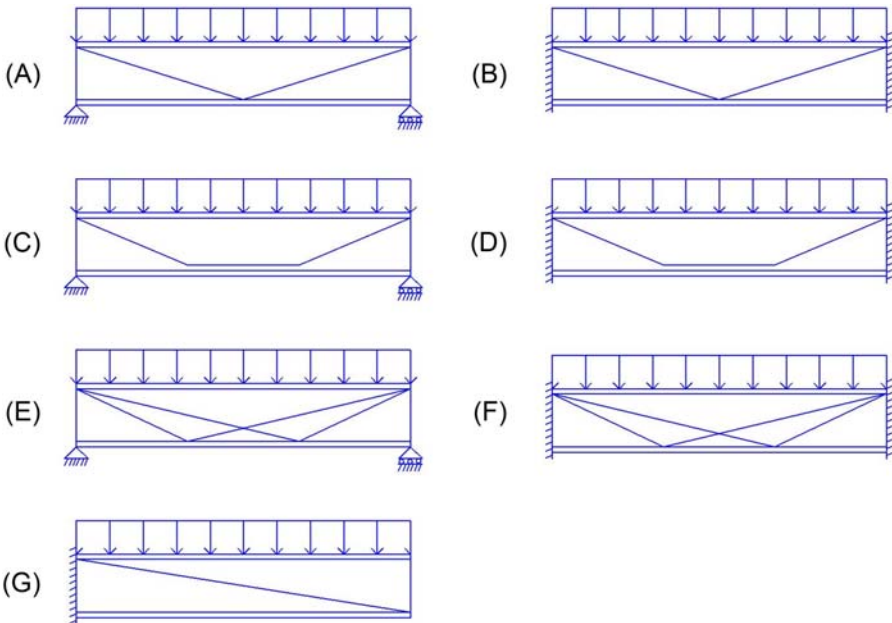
Pretensioned symmetric steel I-beams with steel cables subjected to external loading: (A) a beam with simple supports and the V-shaped cable pattern; (B) a beam with fixed supports and the V-shaped cable pattern; (C) a beam with simple supports and the modified V-shaped cable pattern; (D) a beam with fixed supports and the modified V-shaped cable pattern; (E) a beam with simple supports and two V-shaped cable patterns; (F) a beam with fixed supports and two V-shaped cable patterns; (G) a cantilever beam with steel cables.
